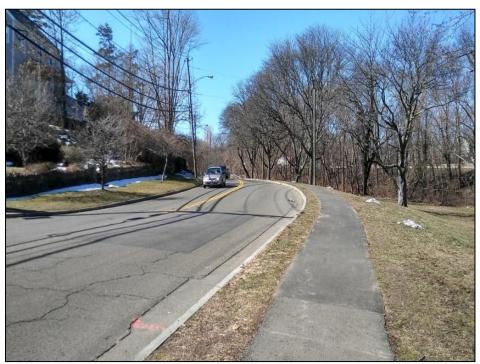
Overview photo of the proposed underground transmission line facing west along Davis Avenue.
